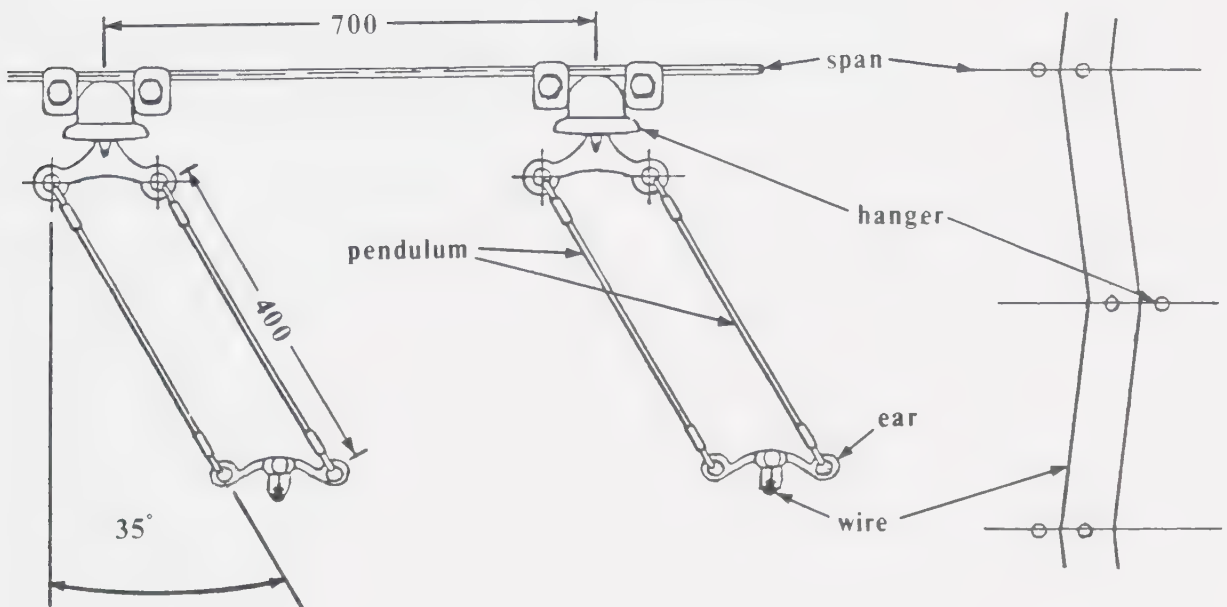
SECTION AND PLAN VIEWS OF KUMMLER & MATTER FLEXIBLE SUSPENSION
